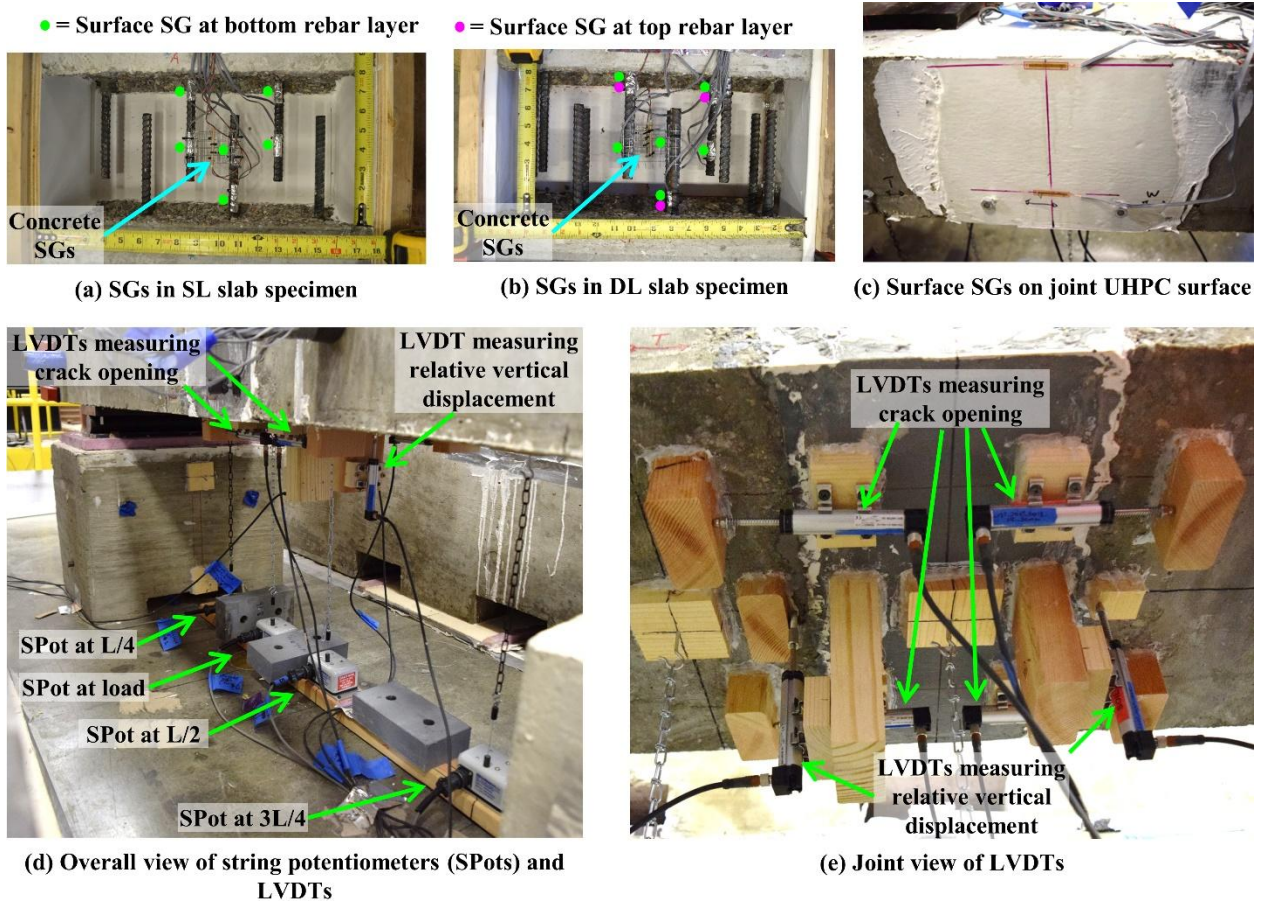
Instrumentation details used in all four slab specimens during Tests S1, S2, and S3
